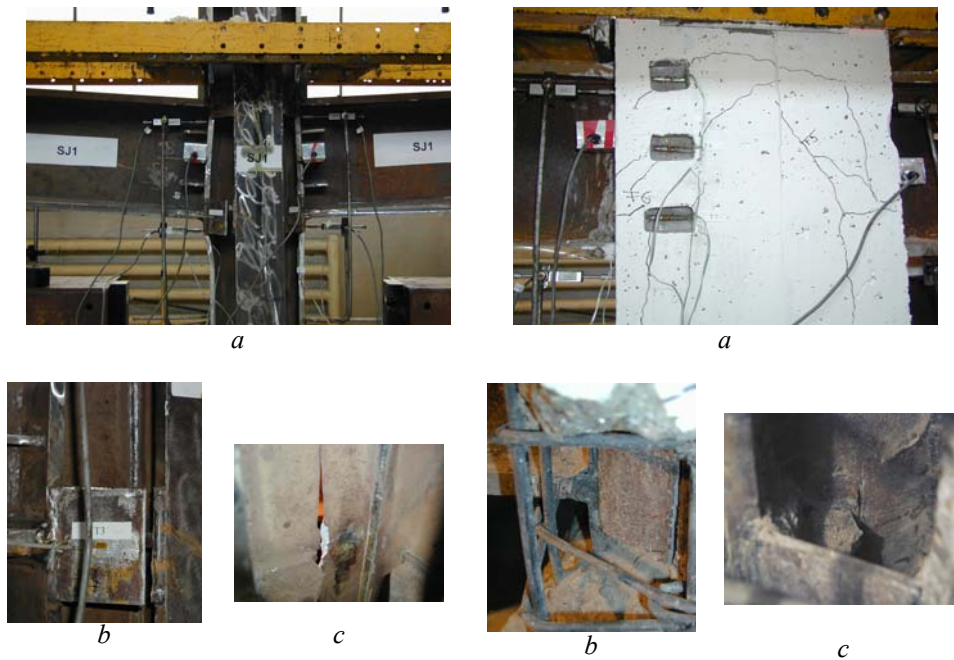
Failure mechanism of steel joint symmetrical load: *a* – front view of steel joint; *b* – tearing of vertical stiffener; *c* – large crack in the joint panel.
